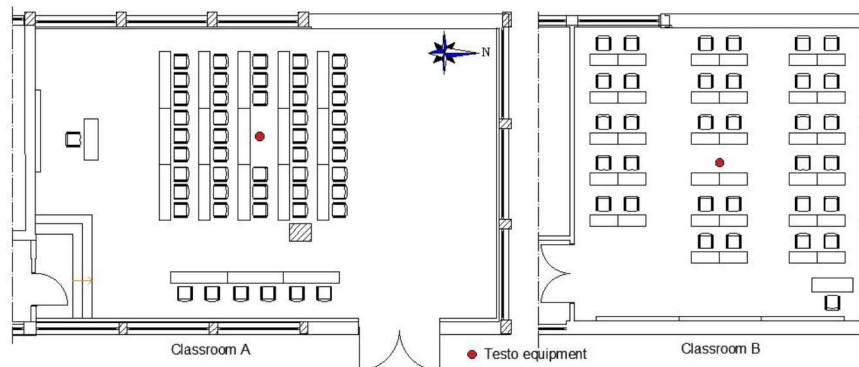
Floor plan of the classrooms with the position of the measurement instruments.
